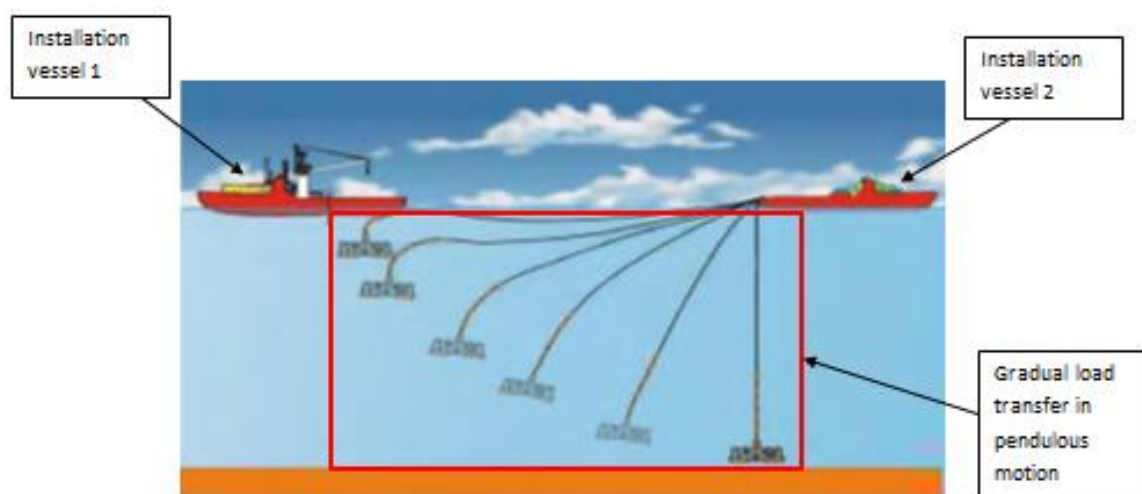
Pendulous Installation, REF [5], Fig. 1
